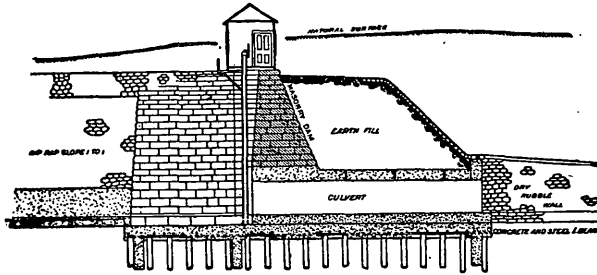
Longitudinal section through gates, dam, and culvert of Twin Lakes reservoir, Colorado.
